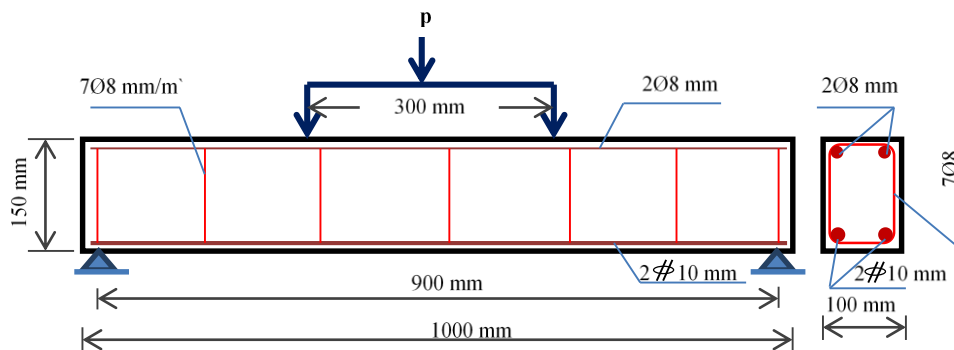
Dimensions, reinforcement and the loading method for beam sample.
